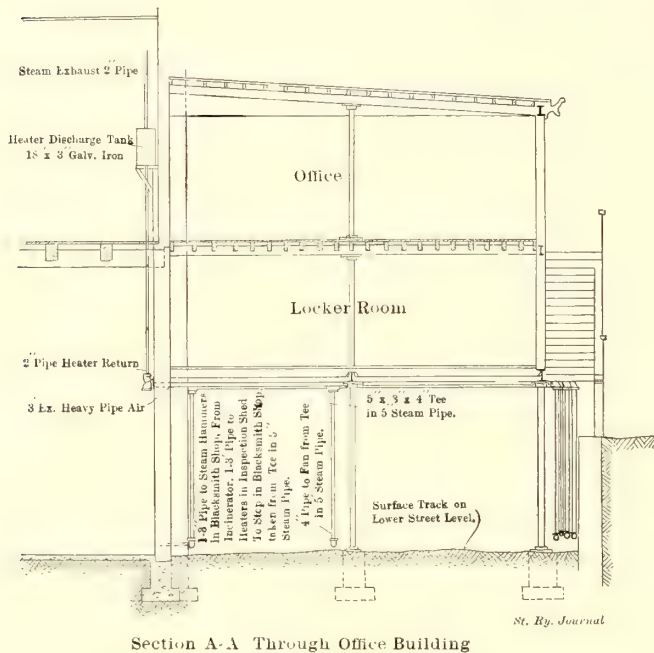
SECTION THROUGH OFFICE BUILDING, SHOWING THE HEATING PIPES UNDER THE LOCKER ROOM
